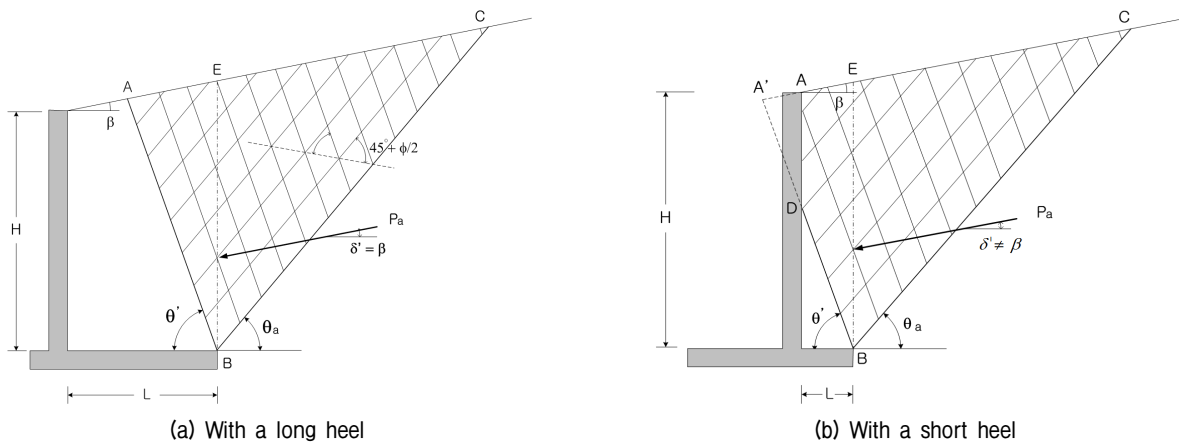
Failure planes of cohesionless soil behind cantilever retaining wall
